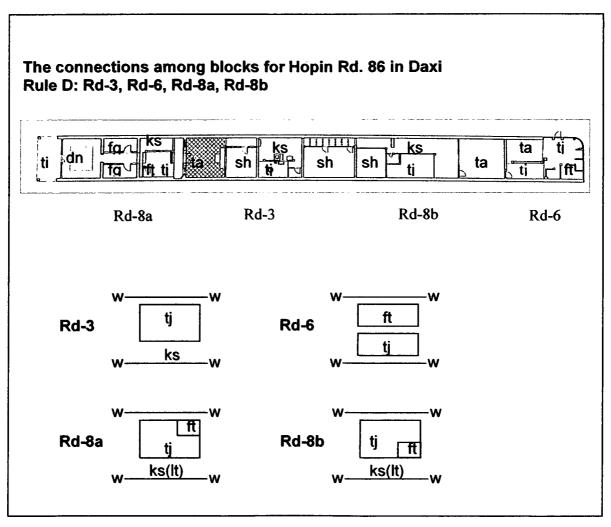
24 Rule D for illustrating the connections between blocks of floor plans at Hopin road 86 in Daxi
